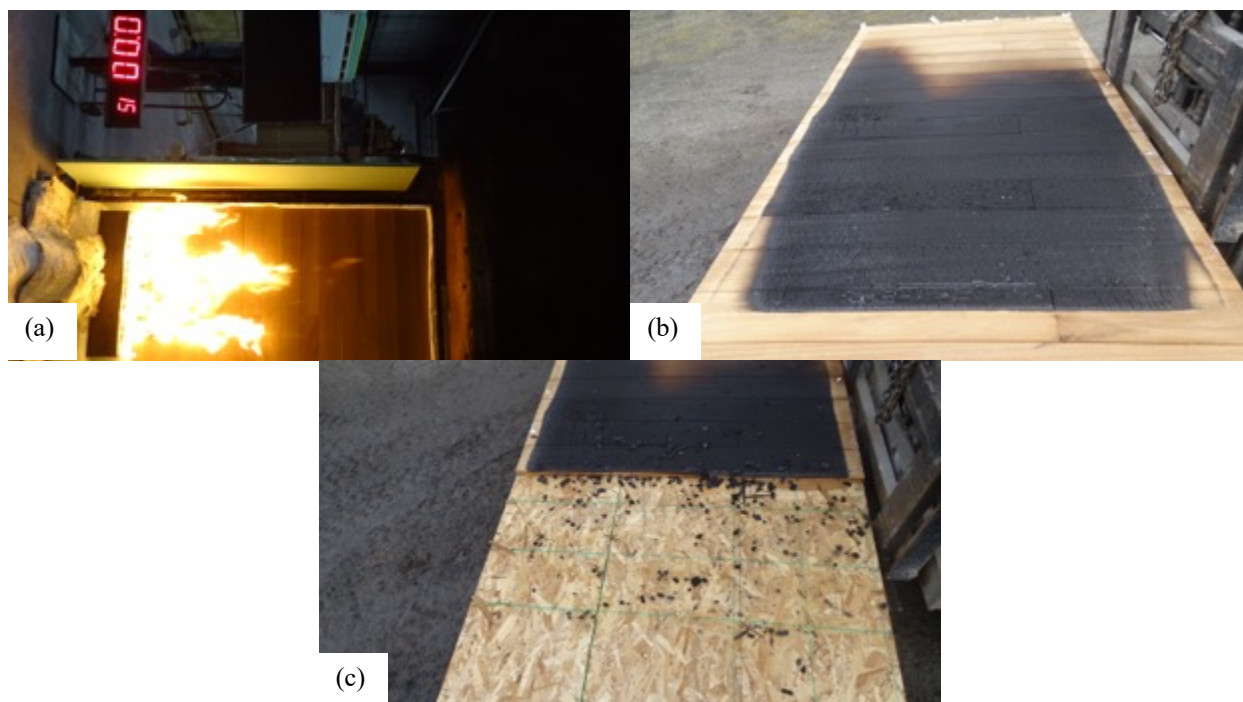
Test 3 showing (a) burner on, (b) face after test, (c) removed siding.
